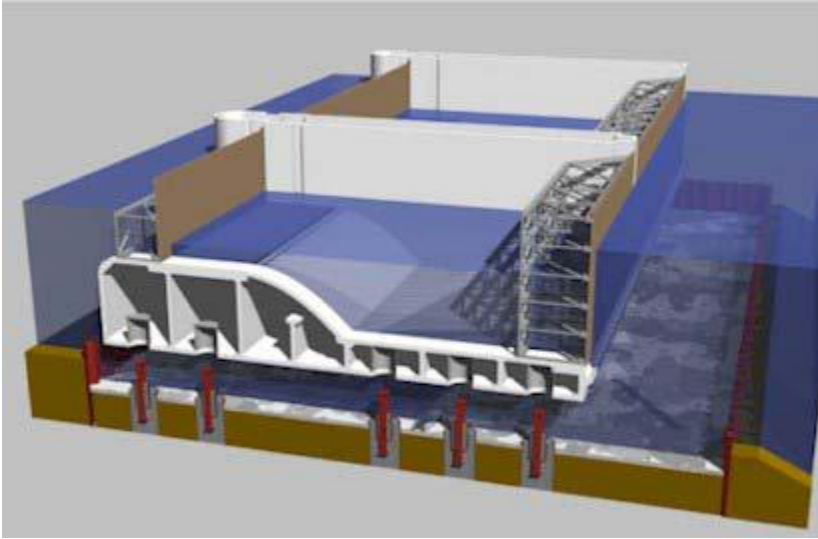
Typical Dam Segment Landing on Pre-installed Caissons (Ben C. Gerwick Inc., 2000)
